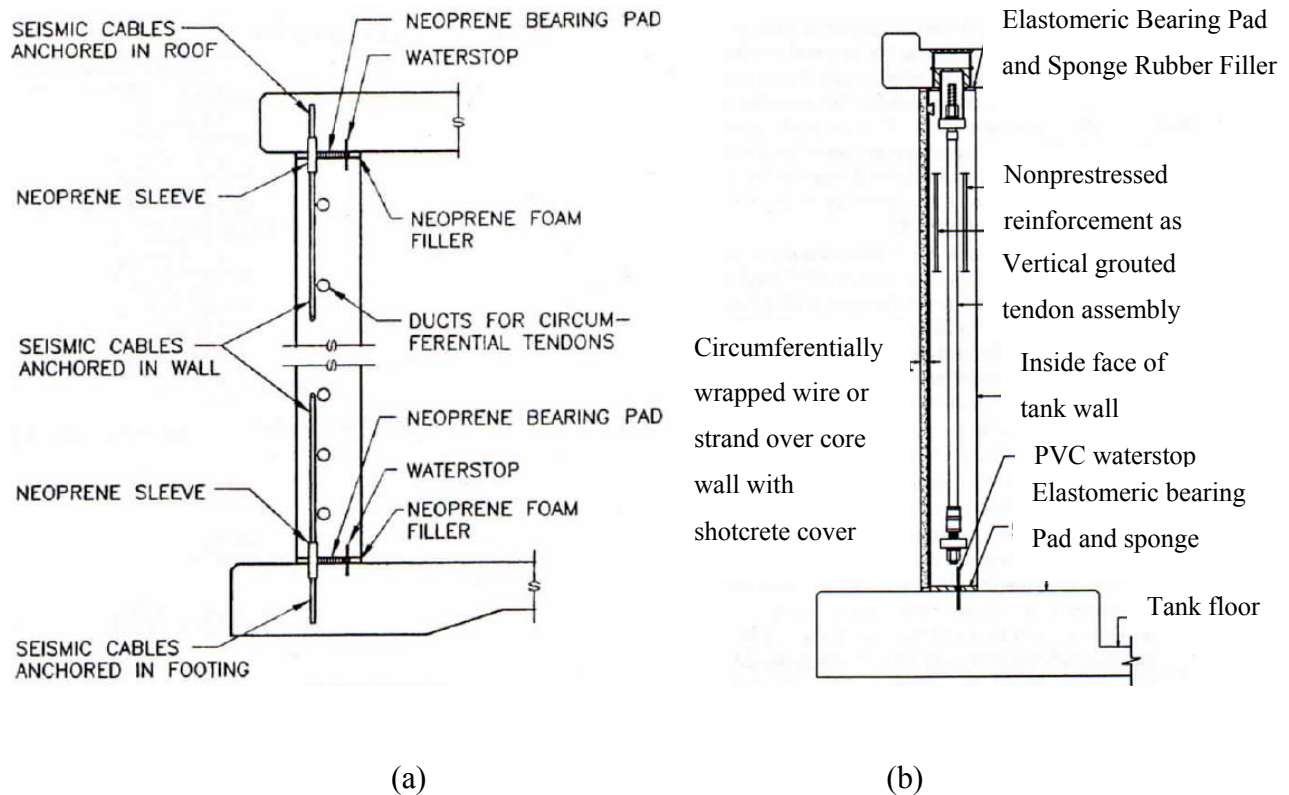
Typical wall section of cast-in-place tank; (a) Horizontally-prestressed, (b) Horizontally and Vertically-prestressed (ACI 373R-97 and ACI 372R-03)
